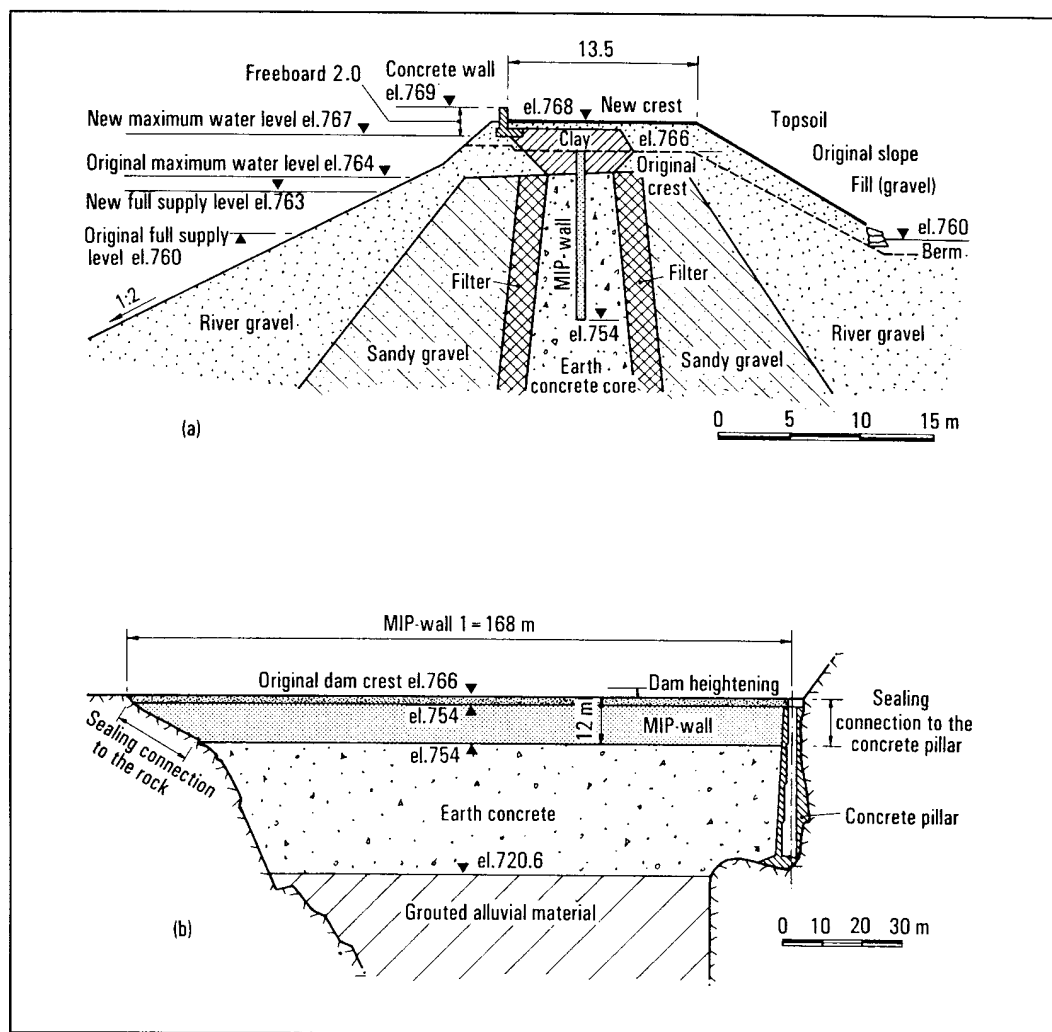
Heightening of Sylvenstein dam: (a) cross section; (b) longitudinal section along dam axis (Wilder et al., 2002)
